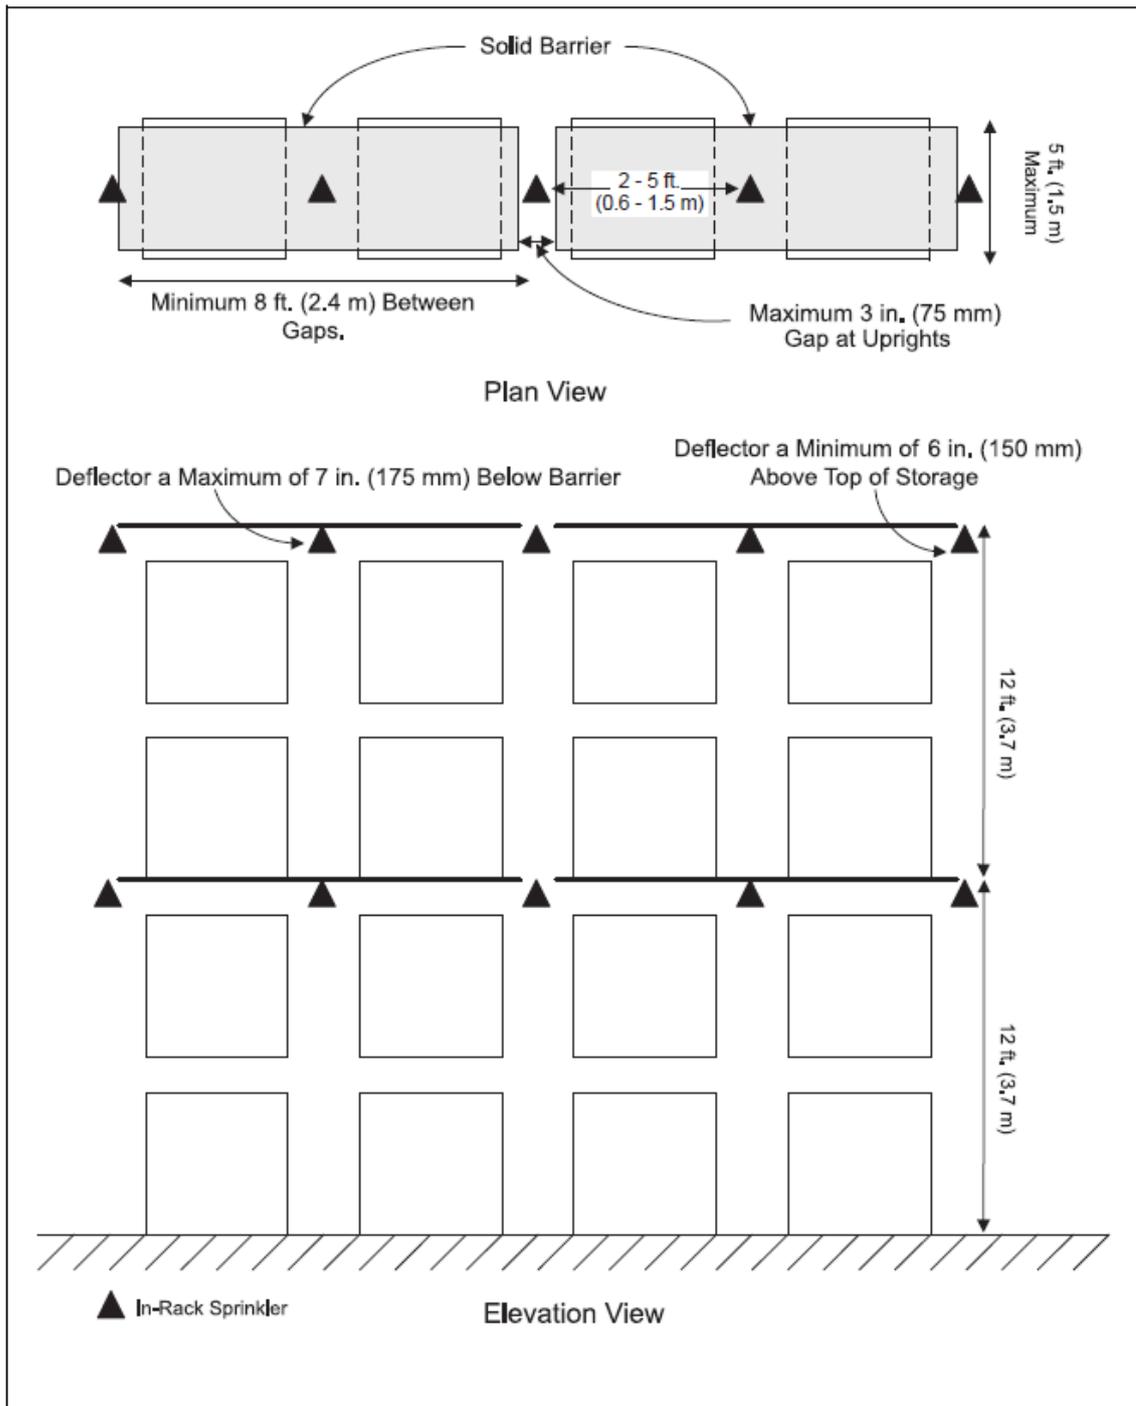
Single-row rack sprinkler layout: fire protection scheme A
